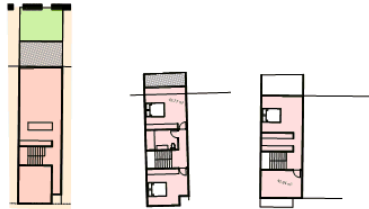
INDICATIVE APARTMENT LAYOUT
